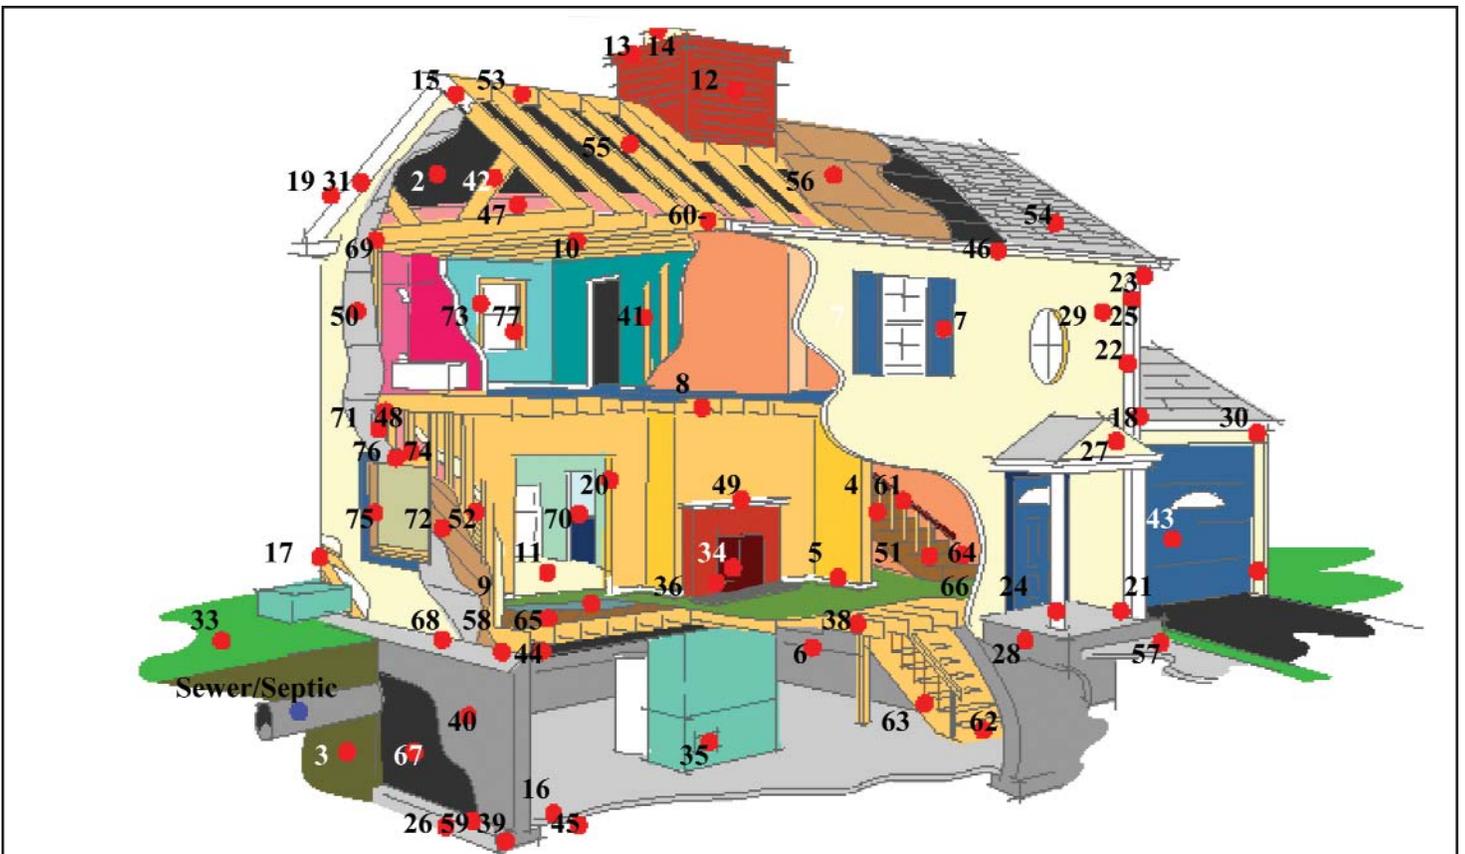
Housing Structure Terminology, Typical House Being Built Today [1]
